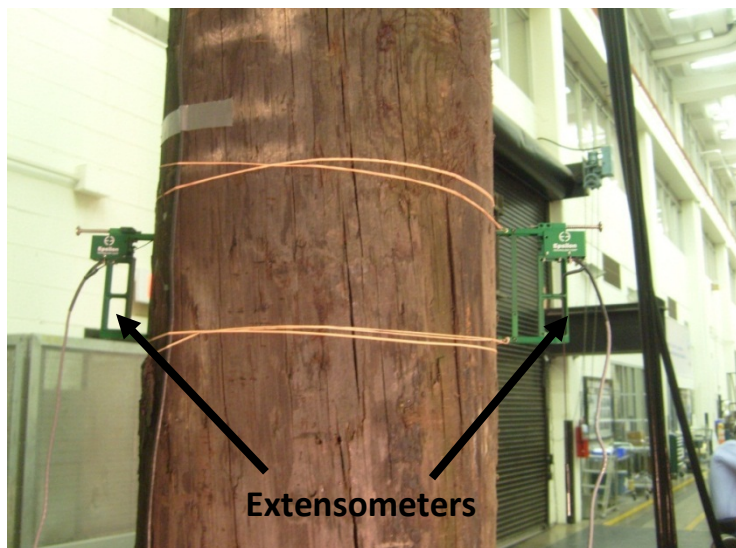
Longitudinal extensometers on both sides of the specimen.
